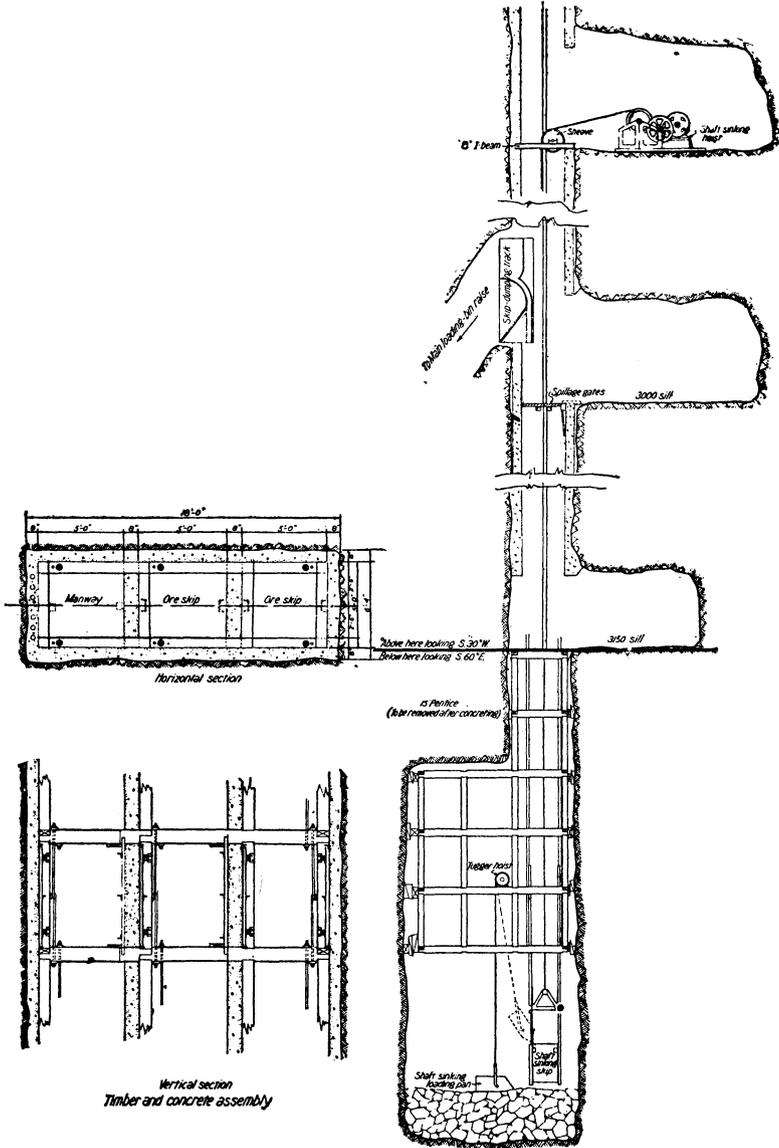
Arrangement for sinking shafts at United Verde mine
